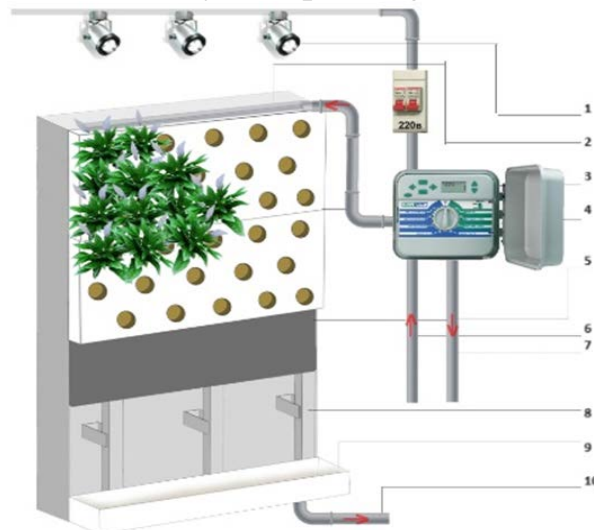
Technical design scheme of the «Green Block» vertical gardening system
